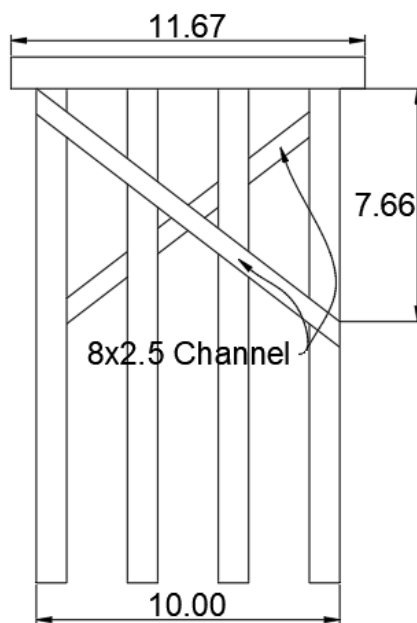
Detail of the spur bridge Pier 5 (central pier) on the right bank.
